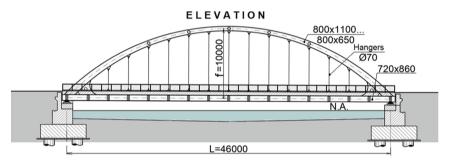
Elevation of the Bridge with two carriage-lanes.
